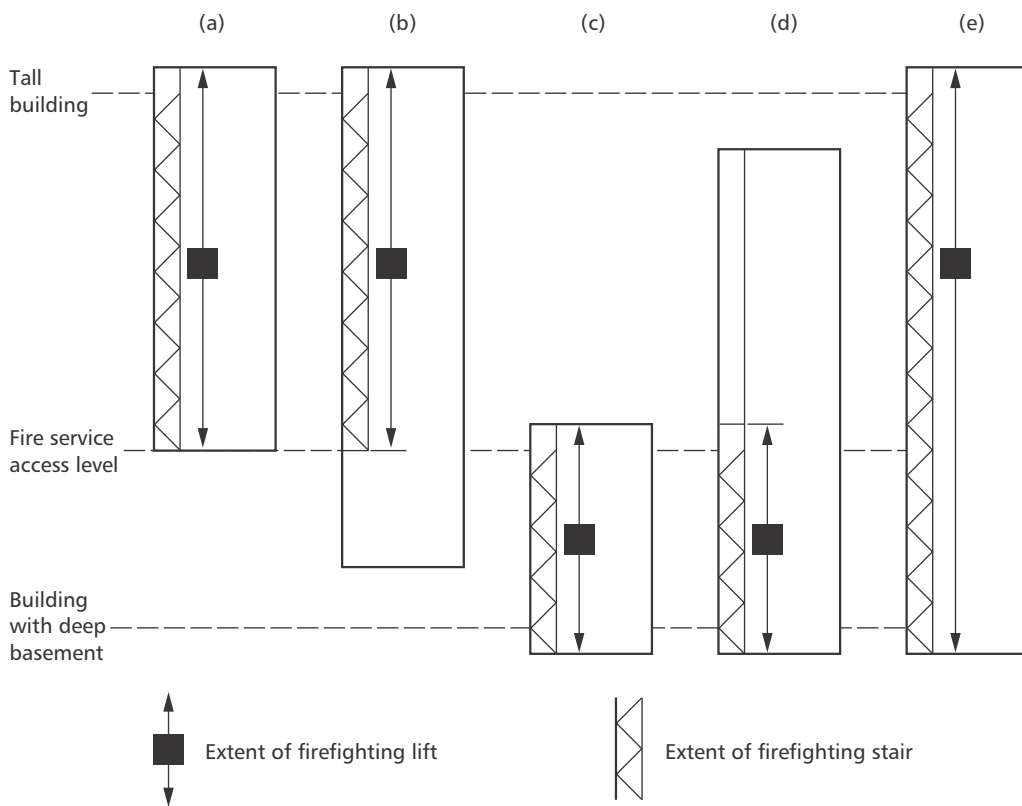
Extent of travel of firefighting lift; (a) buildings over 18 m high without basement, (b) buildings over 18 m high with basement less than 10 m deep, (c) buildings with basement only; (d) buildings less than 18 m high with deep basement, (e) buildings over 18 m high with deep basement
